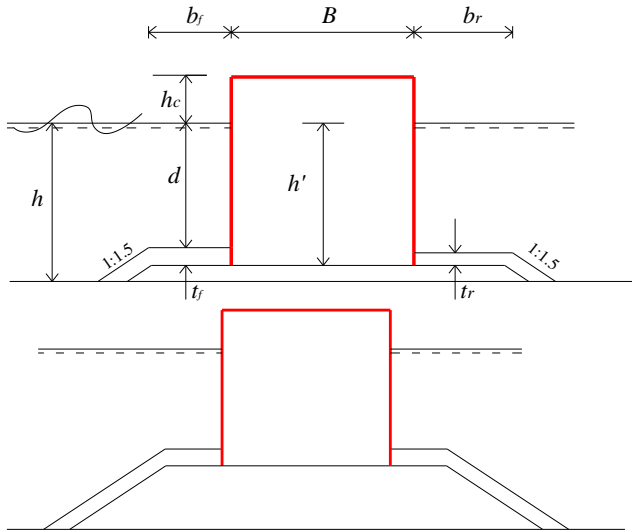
Cross sections of outer caisson breakwaters on bedding layer (top) and on high mound foundation (bottom).
